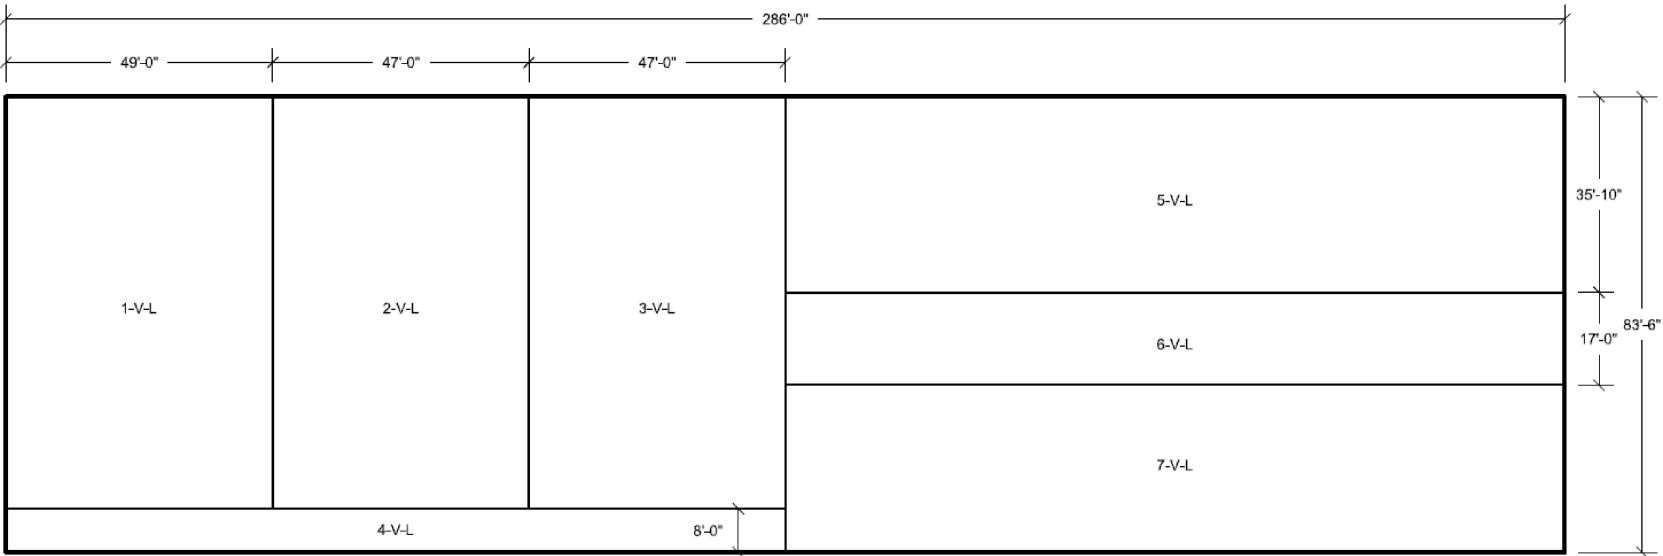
H.6-85 UHS Basin North Wall Looking South Vertical Reinforcement Zones Far Side Face
